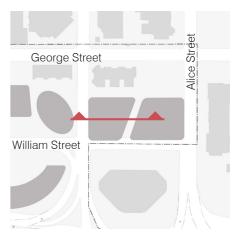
C: PRECINCT 3 MARGARET STREET INTERFACE SECTION - TOWER IN PLAZA OPTION
